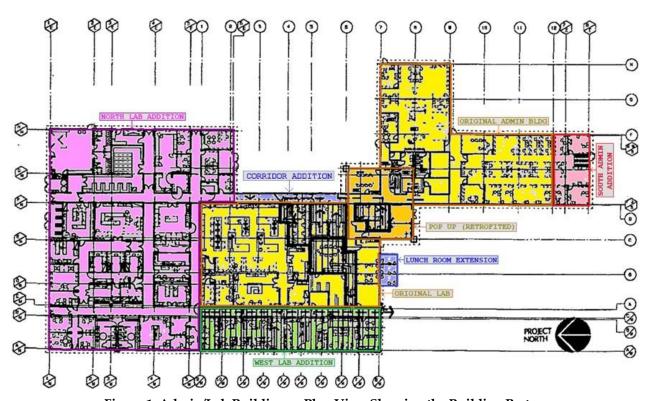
Admin/Lab Buildings - Plan View Showing the Building Parts
